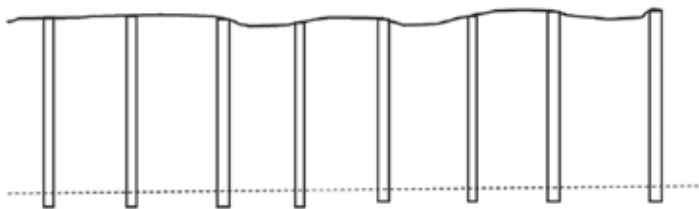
(a) – Fixed length drilling in undulating ground resulting in floor humps
